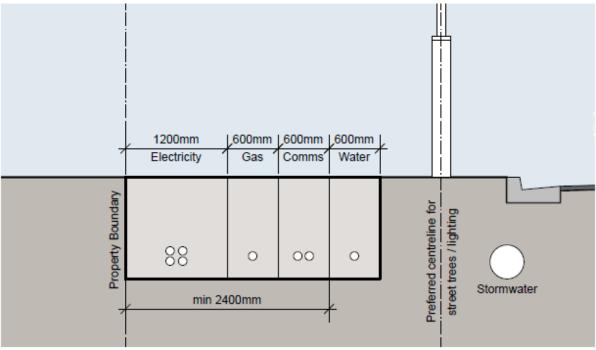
Underground Service Allocation (verge width 3-3.6m)
